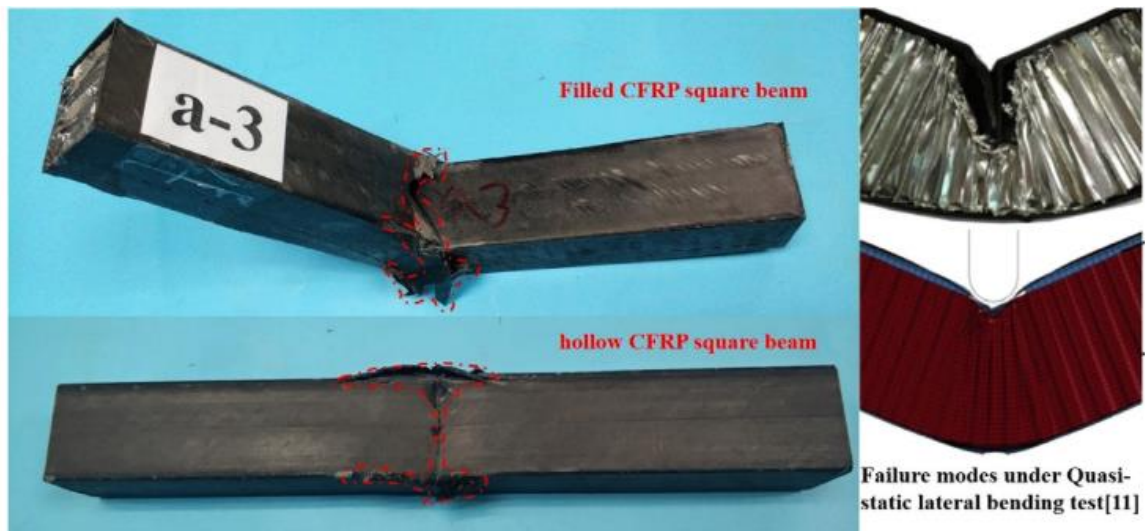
Failure modes of hollow and filled CFRP beams in drop hammer impact test,
